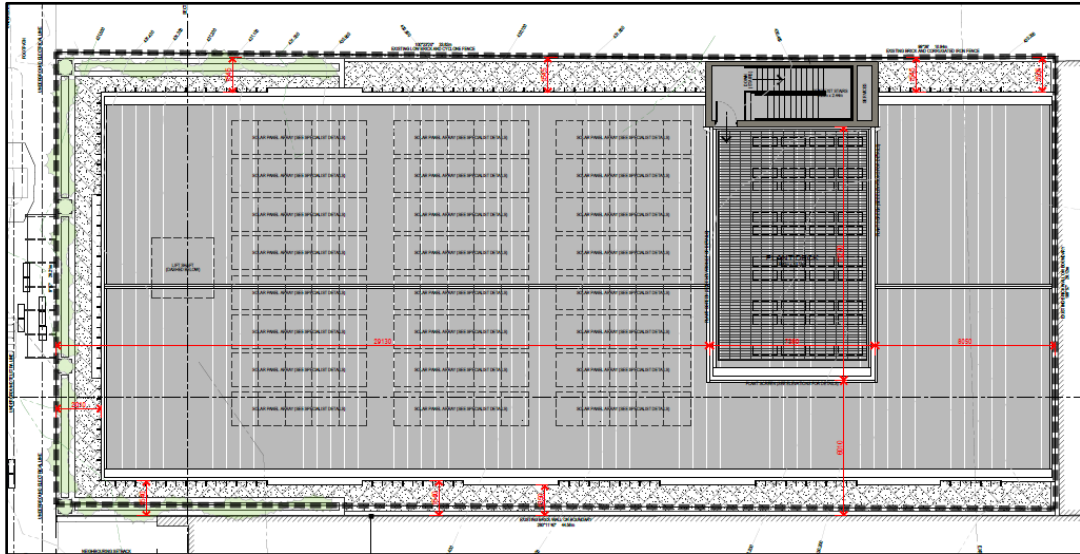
Roof level plan. Source Application plans Project Now Architects
